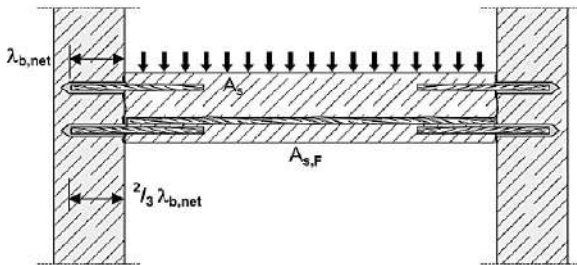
End anchoring of slabs or beams, designed as simply supported.
